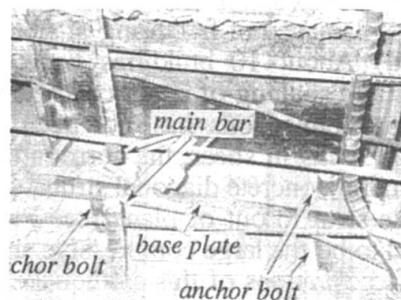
Fracturing of Anchor Bolt at Column Base (after chipping concrete)
